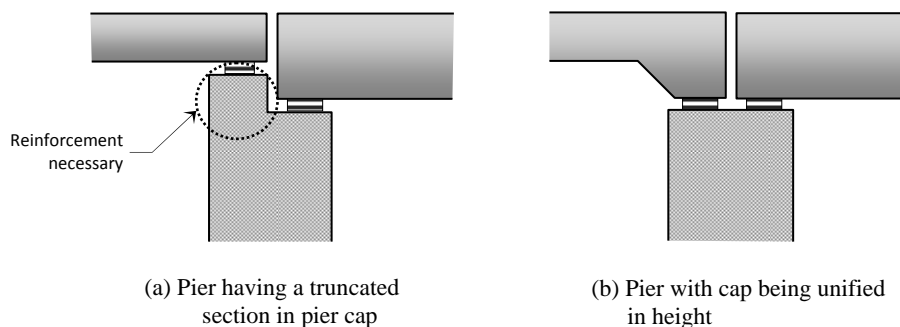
Measures for Dealing with Adjacent Girders of Different Heights
